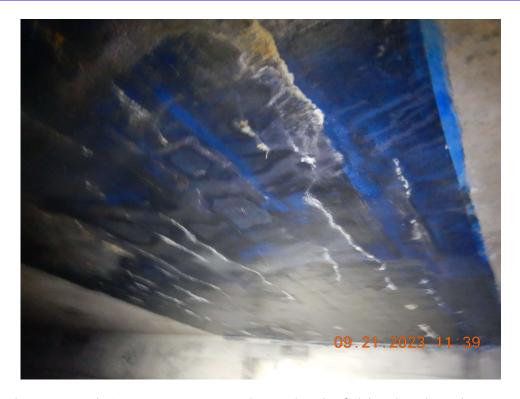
Supply Duct – Sta. 194+50 Patch in Underside of Slab with Carbon Fiber Wrap
